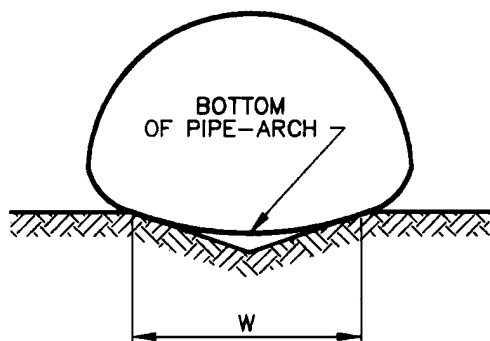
Shaped Bedding for Large Pipe-Arch, Horizontal Ellipse and Underpass Structures
